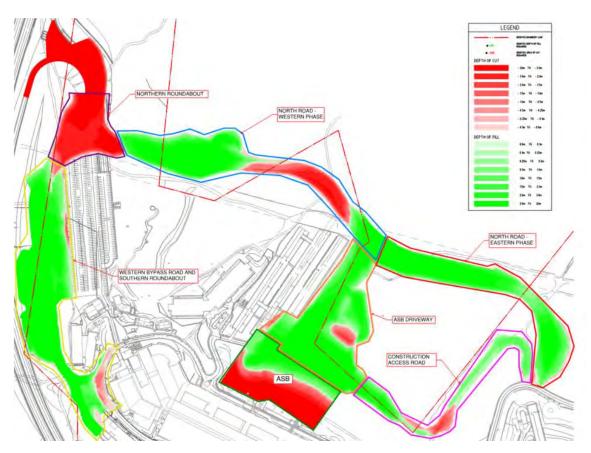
Bulk Earthworks Plan – refer to appendices for details
